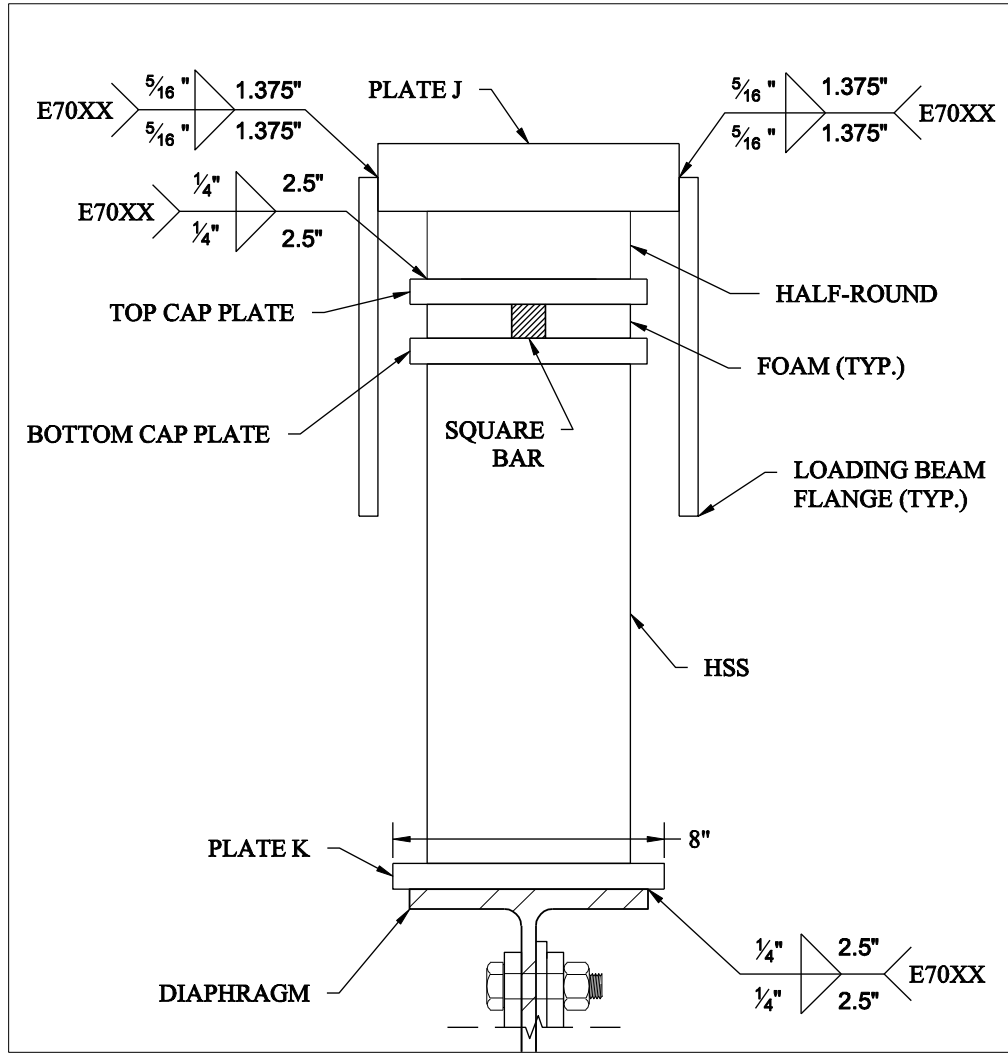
Section A-A of Figure 5.2 - longitudinal plane cross section view of load bearing assembly at Section A
